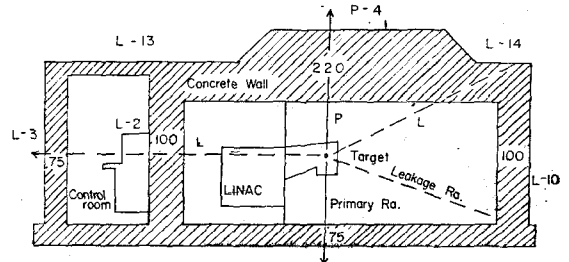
Vertical section of treatment room showing protective barriers and interesting points.
